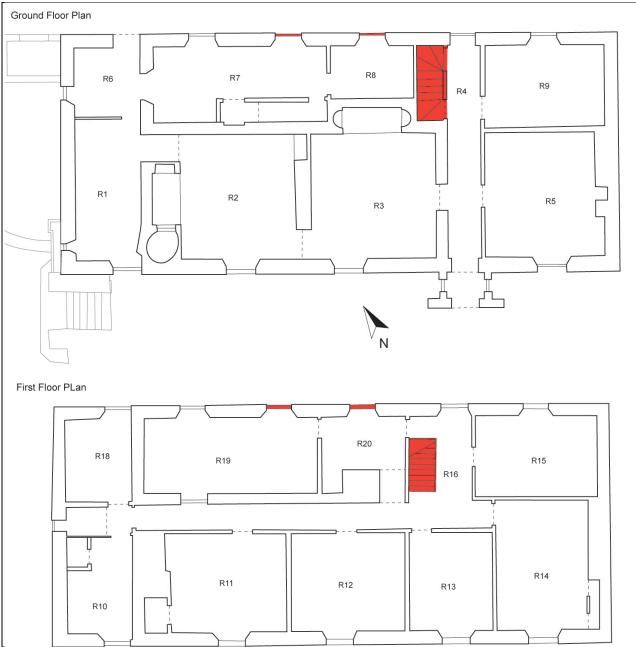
Plan of the building showing room numbers. The architectural features highlighted in red were subject to detailed recording and photography.
